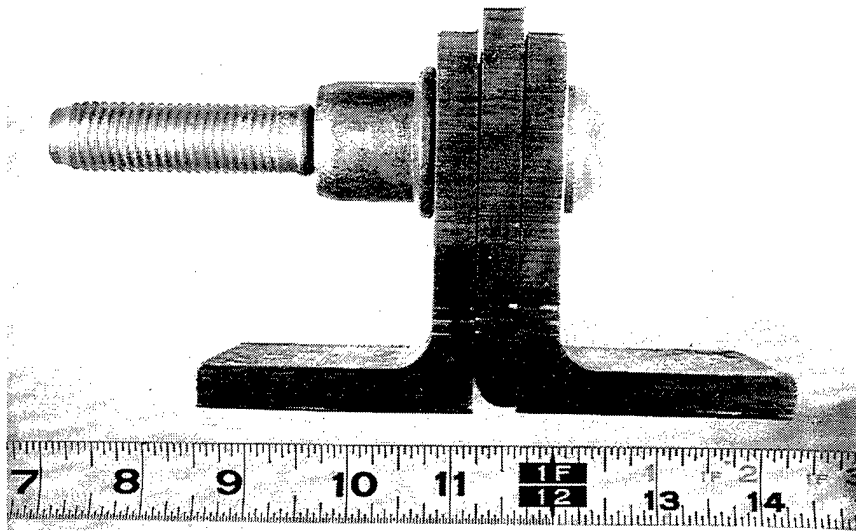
Shear test specimen with a Huckbolt fastener prior to swaging of the collar. The grip stem will be grabbed by the installation tool and broken off after the collar is swaged onto the locking groove section of the pin by the anvil of the tool.
